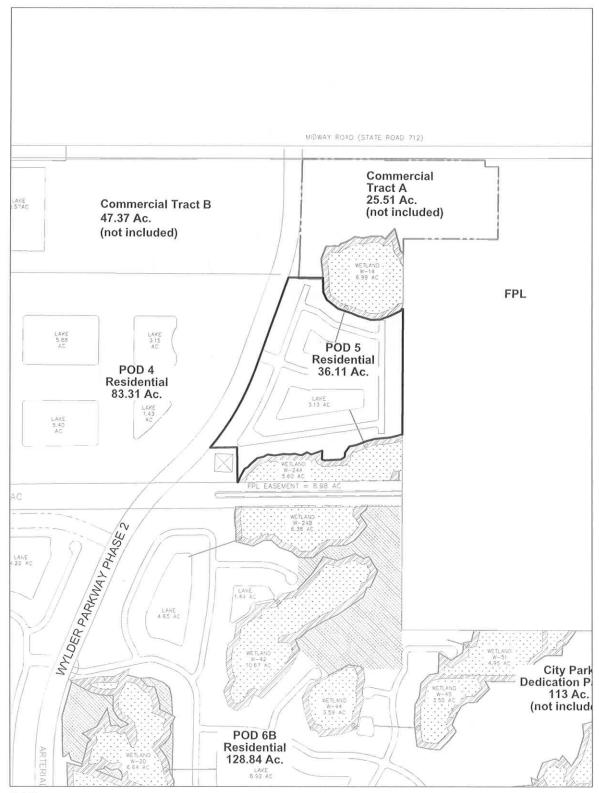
SITE PLAN LTC RANCH - POD 4
